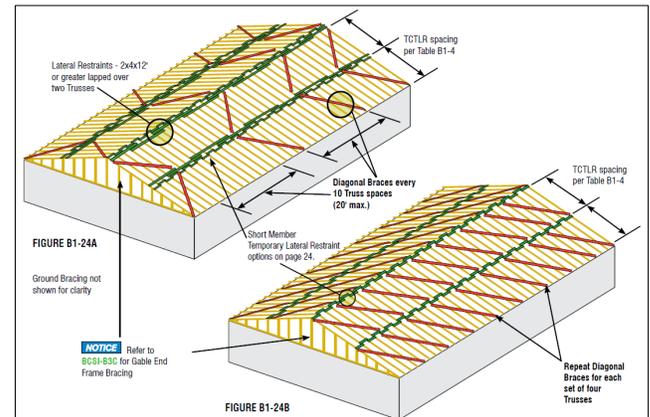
Typical temporary top chord bracing for erection (Source: BCSI Canada¹)
